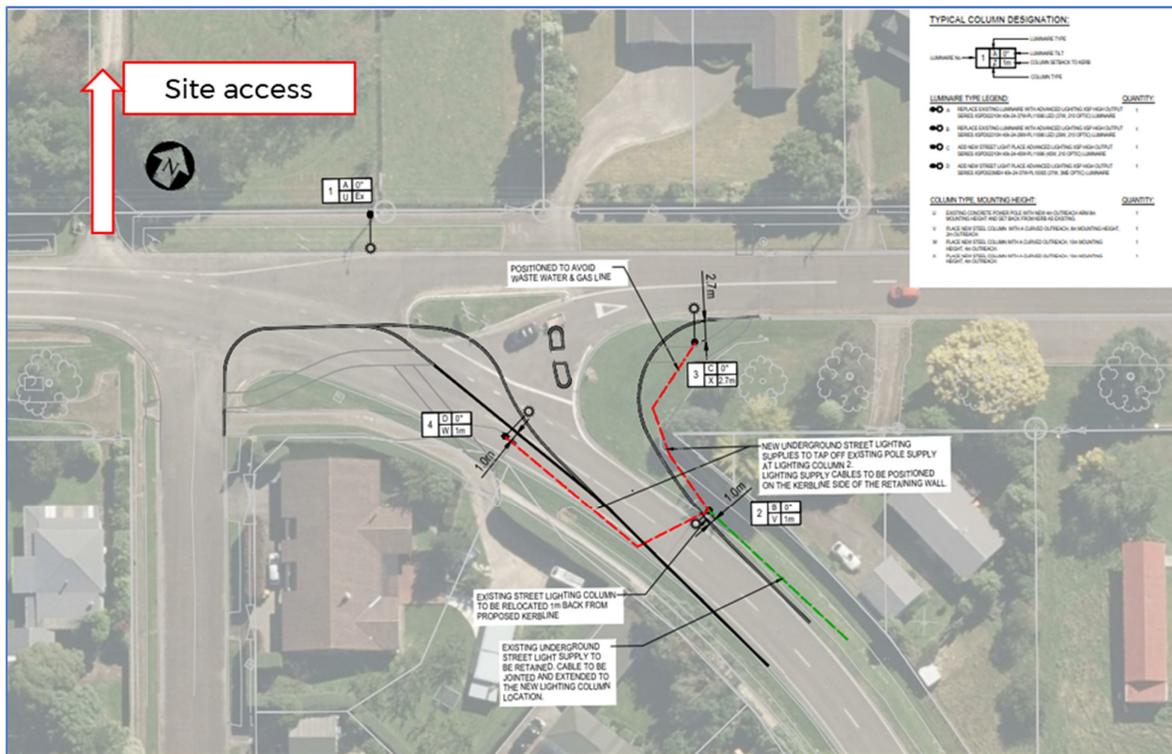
Recent changes to the intersection arrangement at Mulgrave Street
